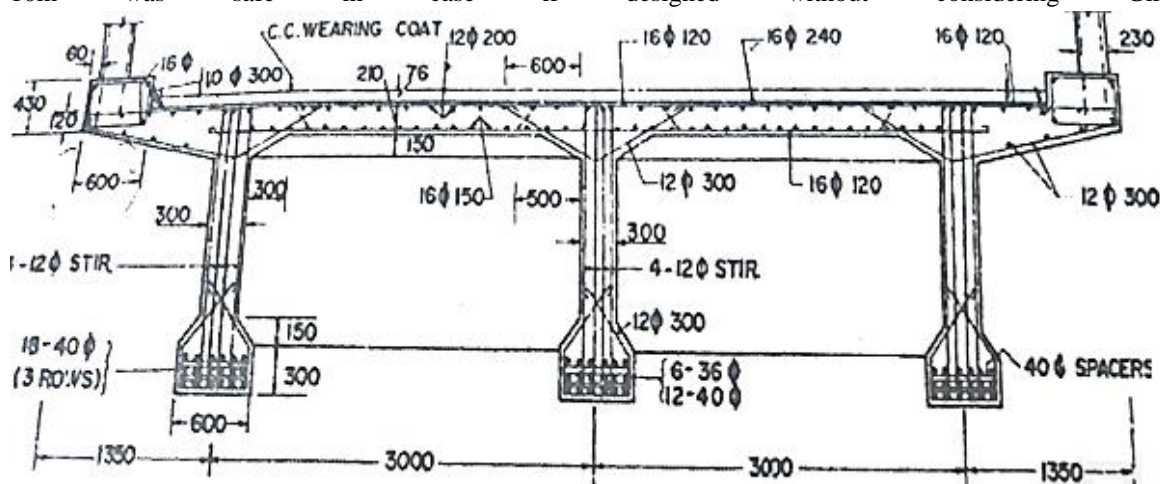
Deck Reinforcement at mid span of Girder (IS Method)
